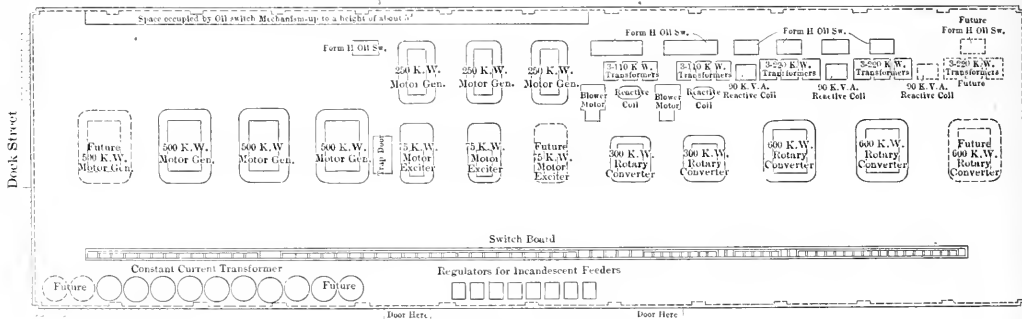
PLAN OF DOCK STREET SUB-STATION.
